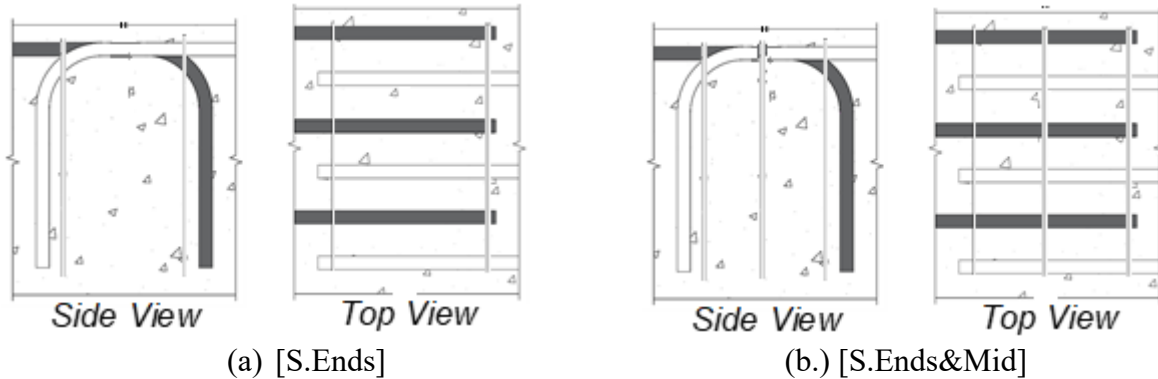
Cross-section for Transverse Reinforcing Arrangements
